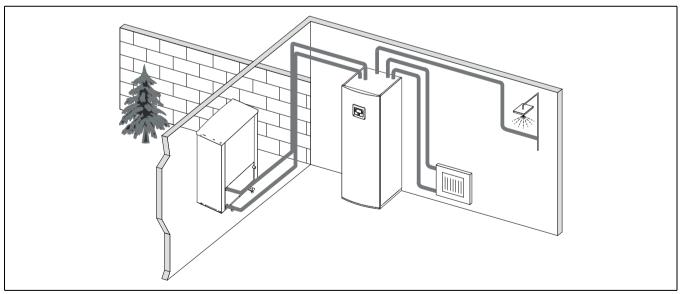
Heat pump Compress 7000 AW, indoor unit AWM / AWMS with integrated DHW cylinder and booster heater
